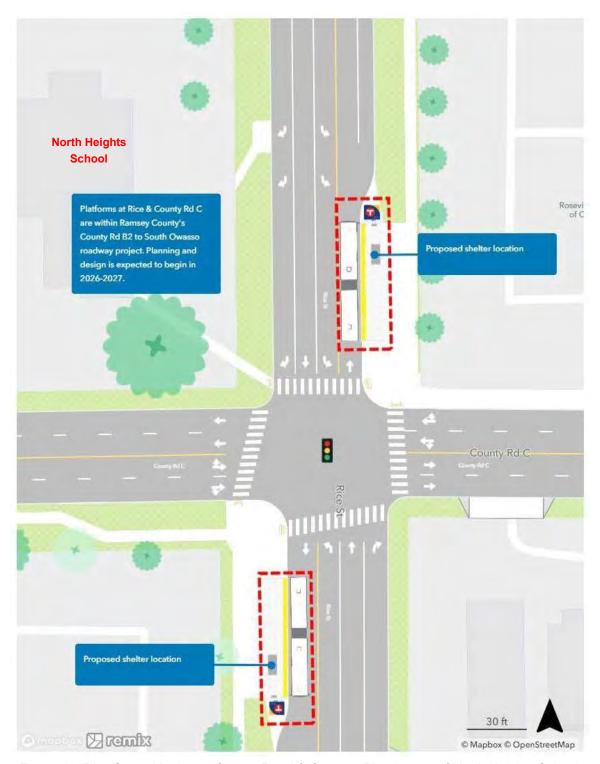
Rice Street North and County Road C Concept Plan in area of North Heights School.
